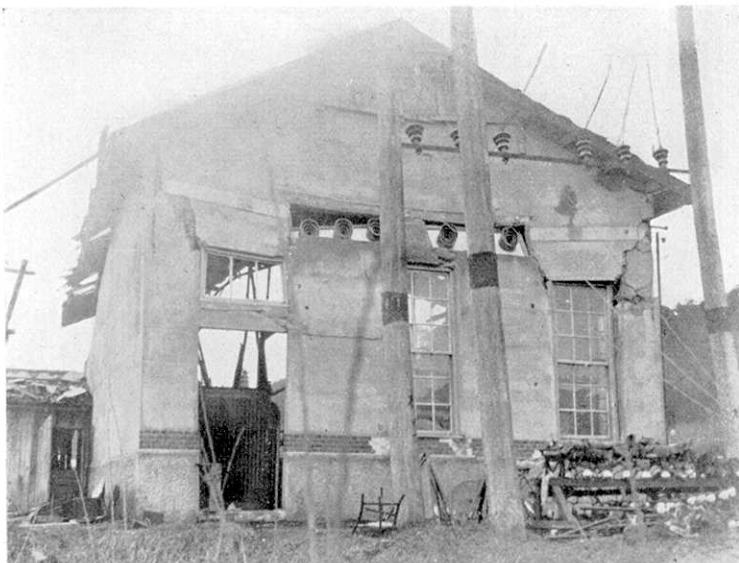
The Yamada electric substation, constructed of inferior concrete.
